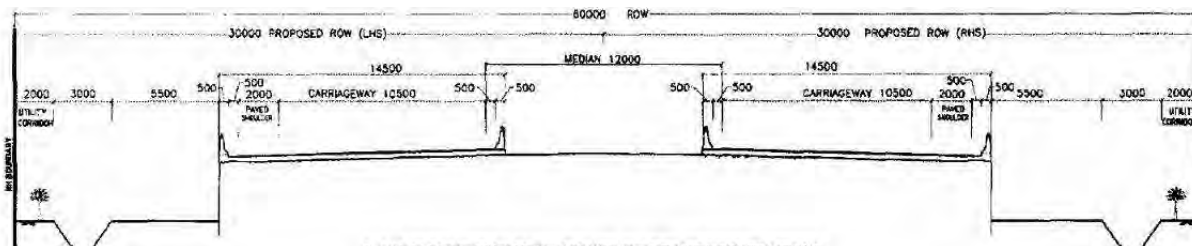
Typical Cross Section for 6 lane of PUP/CUP without service road (TCS-19)
